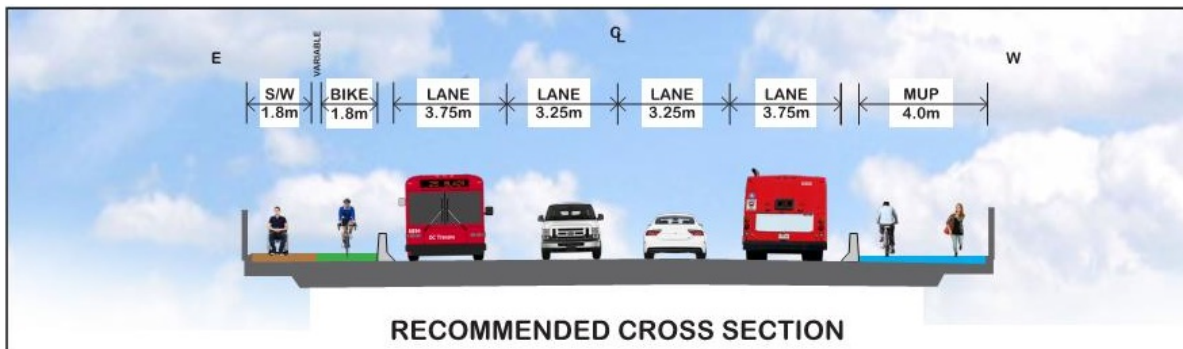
Recommended Blair Road/OR174 Bridge Cross-Section
